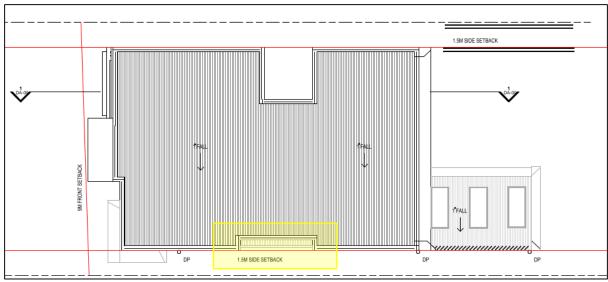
Revised roof plan depicting small cut out on the southern side elevation
